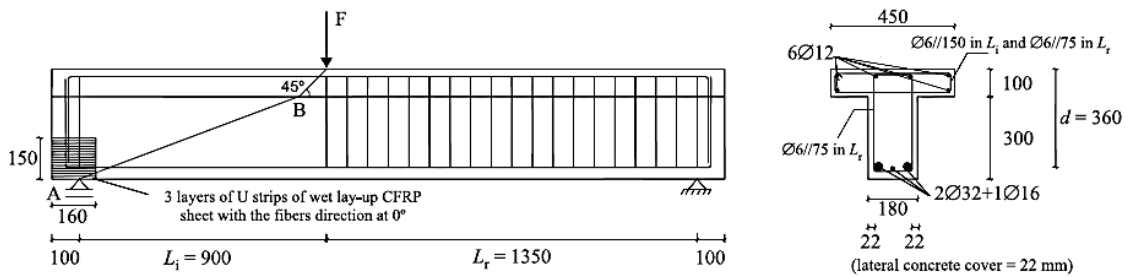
Geometry of the type of beam, steel reinforcements common to all beams, support and load conditions (Dias and Barros, 2012) - dimensions in mm.
